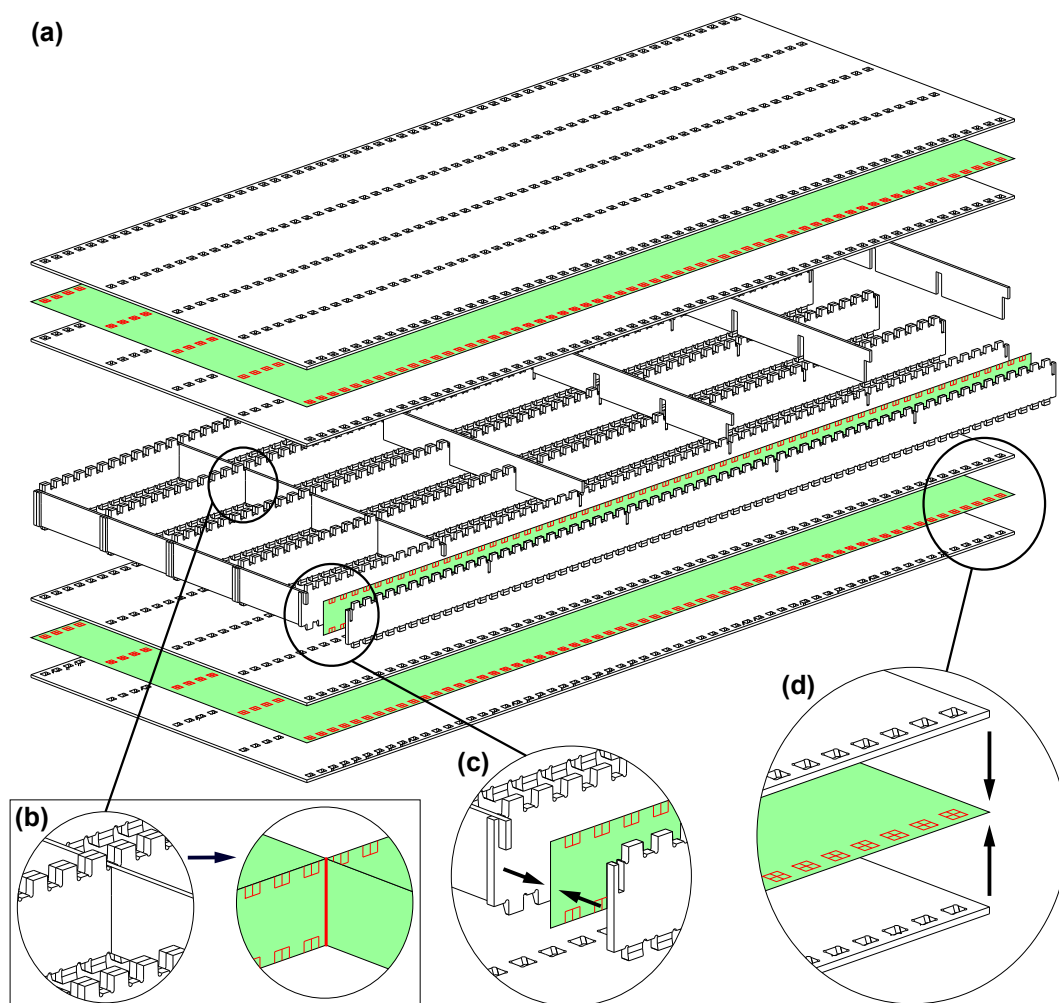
Simplified shell geometry the FE analysis: (a) Exploded view of the studied roof element / (b) Detail of the rigid connection between transversal and longitudinal beams / (c) Model representation of the two longitudinal beam layers as one shell element / (d) Model representation of the two flange layers as one shell element. The red lines represent the shell partition for the connections.
